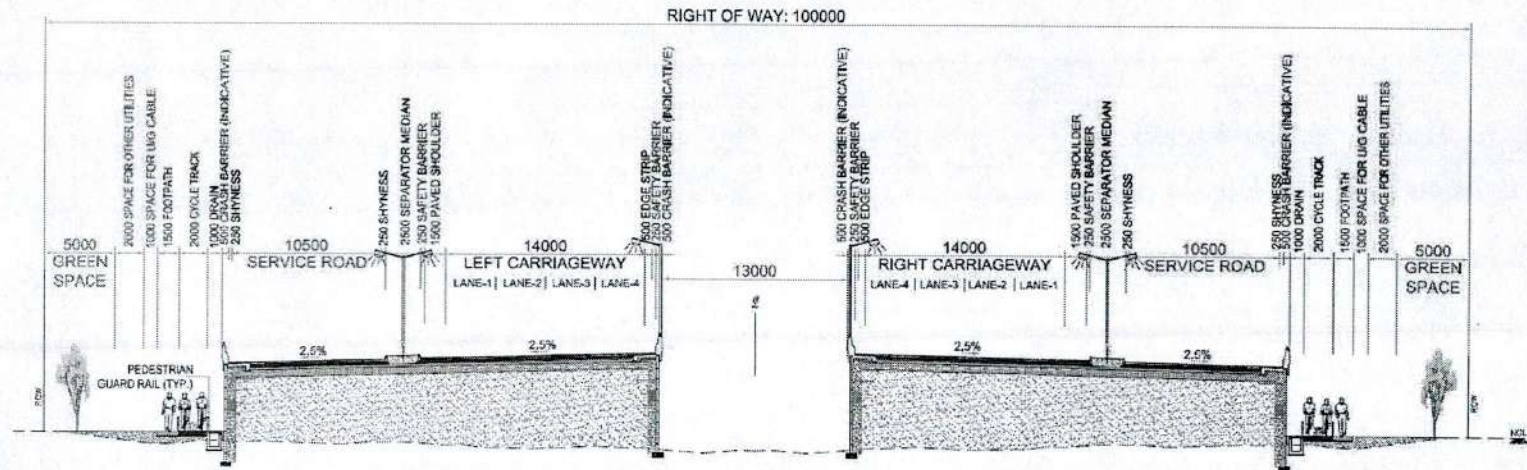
Typical cross section (at ROB approaches) of the proposed PRR showing various elements
